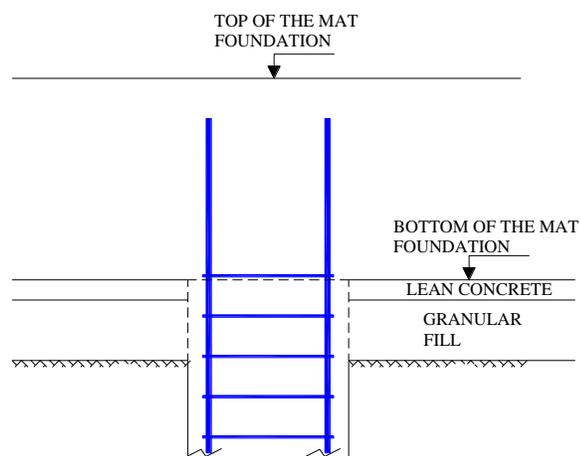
Typical Section for Barrette and Mat Foundation (ZETAS, 2009)
